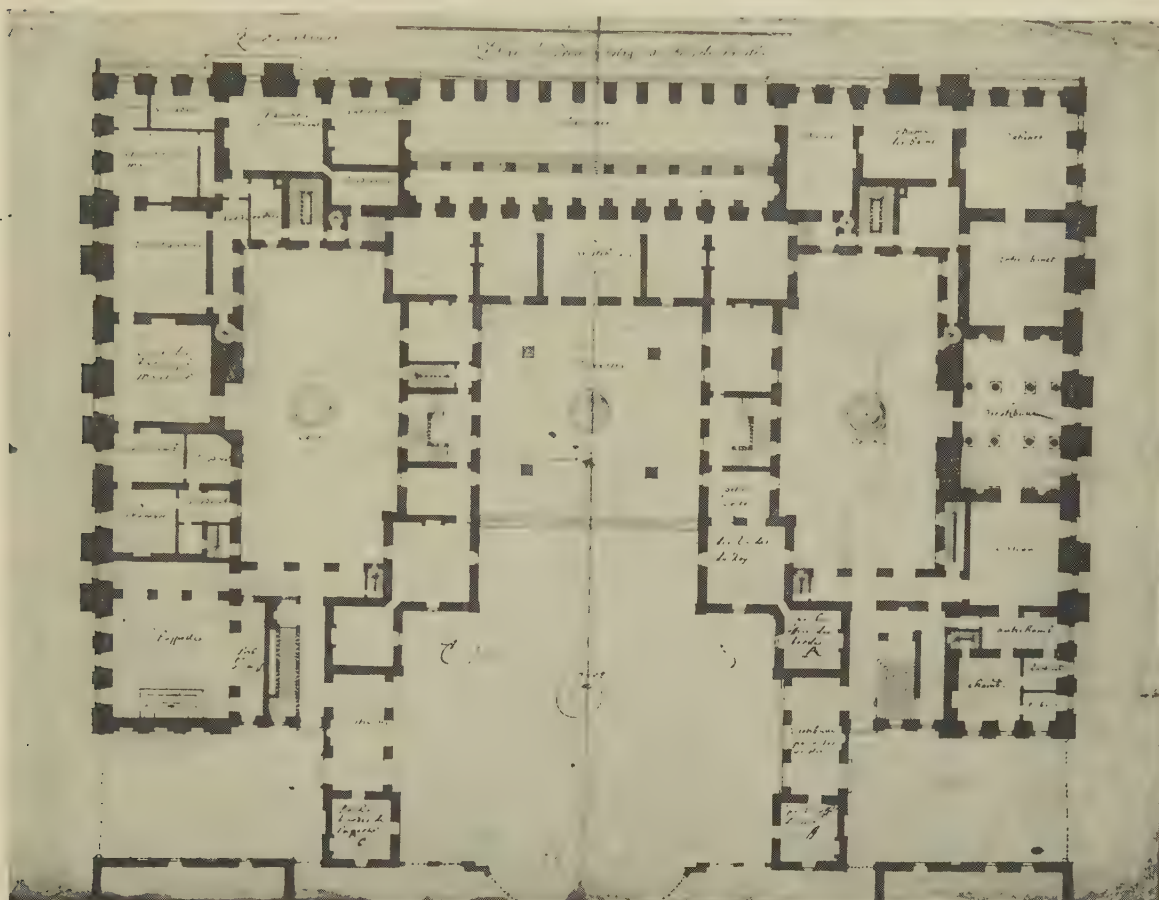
Le Vau's final plan for the Château, Autumn of 1669. — Ground story.
